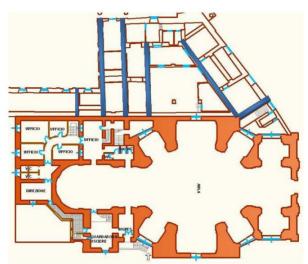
Plan of the church and seismic resistant walls of adjacent building (in blue).
